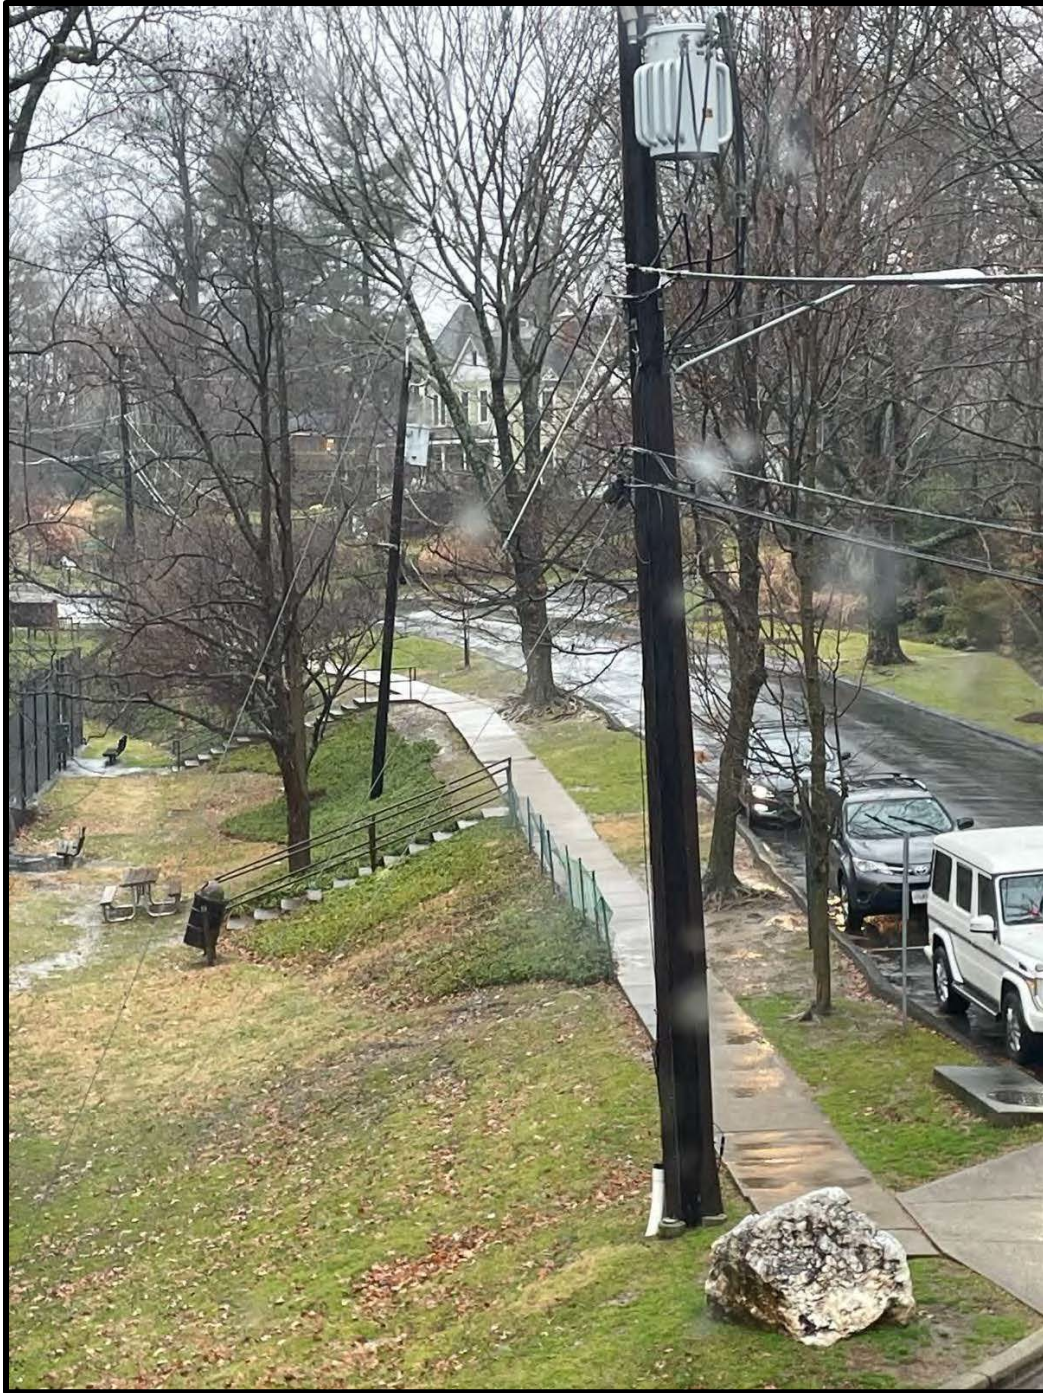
This photo provided by the applicant shows the existing sidewalk section to be replaced and widened.
